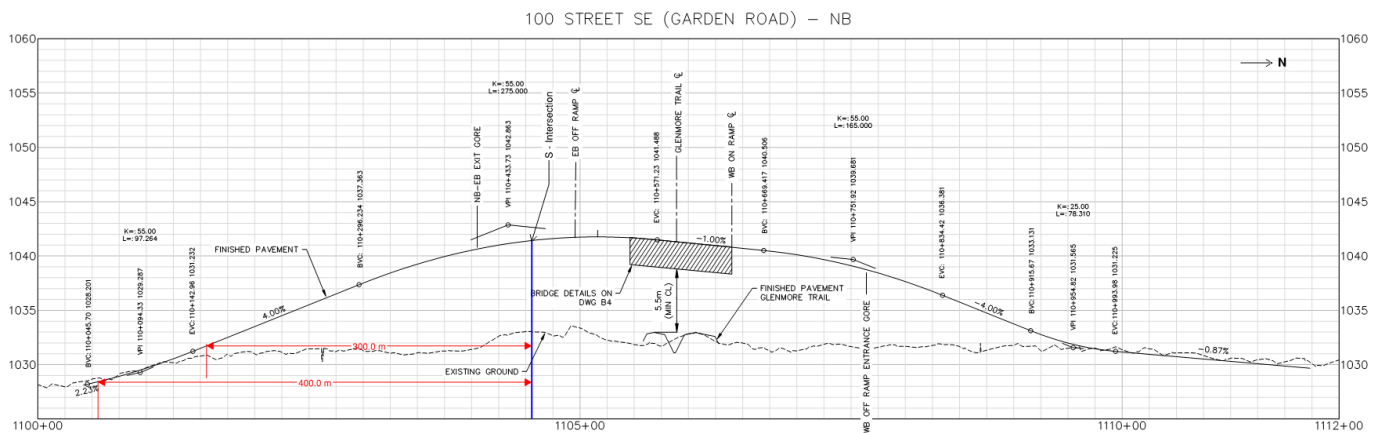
100 Street SE (Garden Road) Proposed Northbound Road Profile
